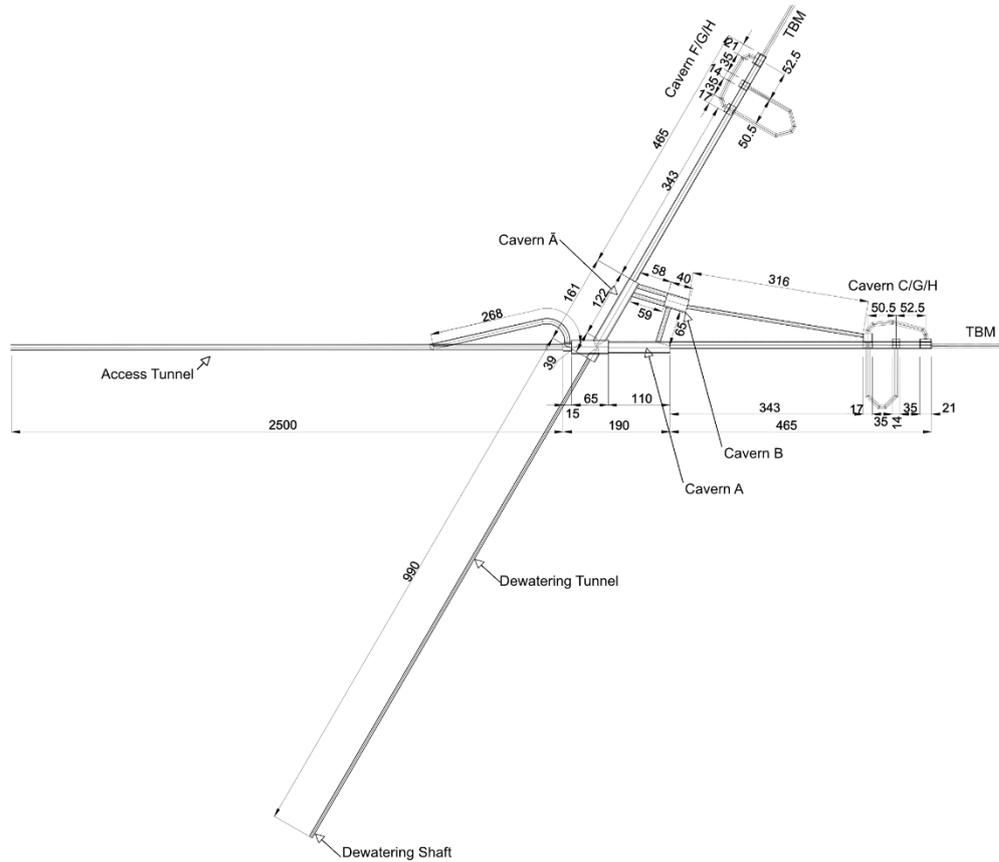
Schematic plan view of the Access Area 1 with an inclined access tunnel solution
